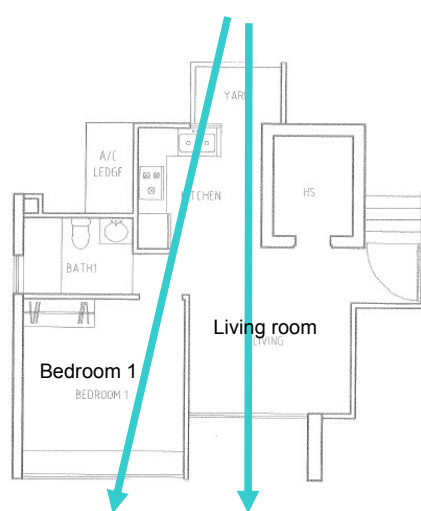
Dwelling unit layout showing that both living room and bedroom 1 are considered to have true cross ventilation and meet the requirement 1-2(a) Option 2(i)
